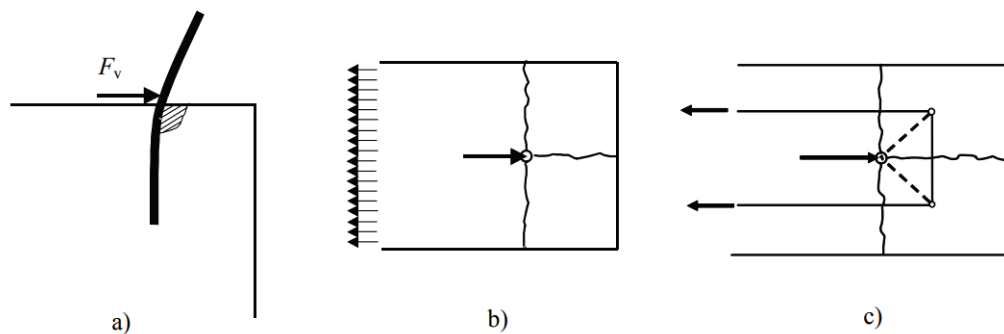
Splitting effects around dowel pin loaded in shear, a) shear force acting on dowel bar indicating area of concrete under dowel subject to high stress concentration, b) potential planes of cracking, c) strut and tie model for design of splitting reinforcement – no splitting reinforcement found within wall panels.
